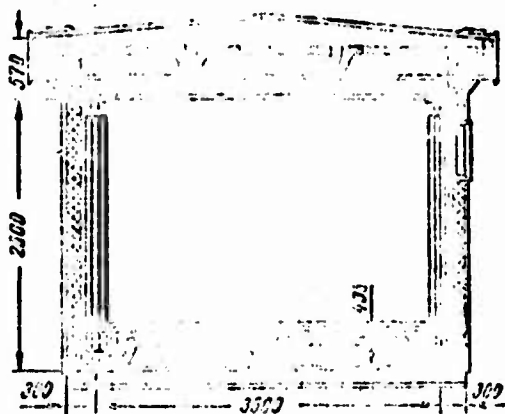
The transverse section of the gallery with large-size capping and flooring slabs.
